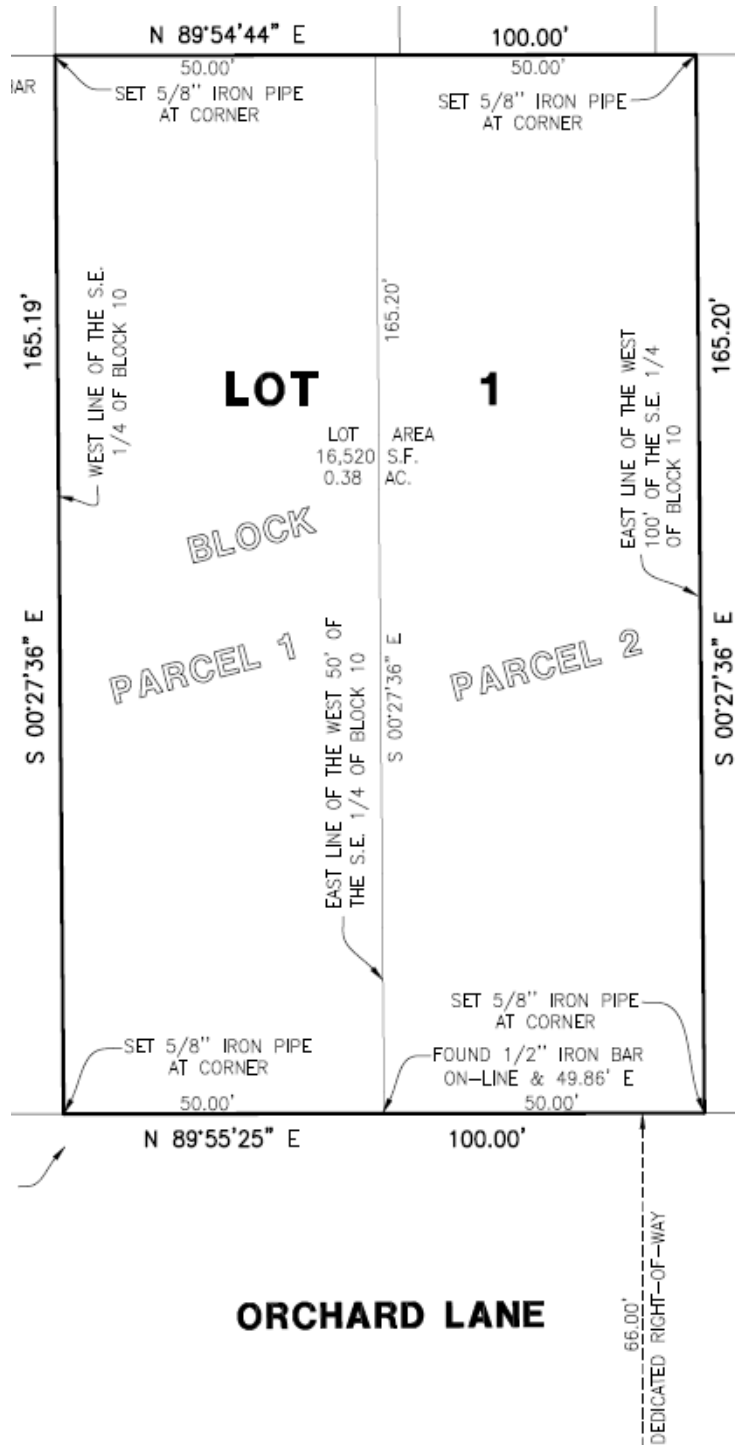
Excerpt of Proposed 557/561 Orchard Lane Consolidation Plat
